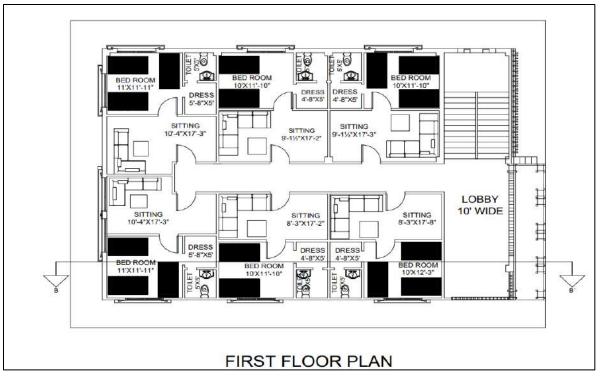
Hostel top view - First floor (AutoCad 2022)
